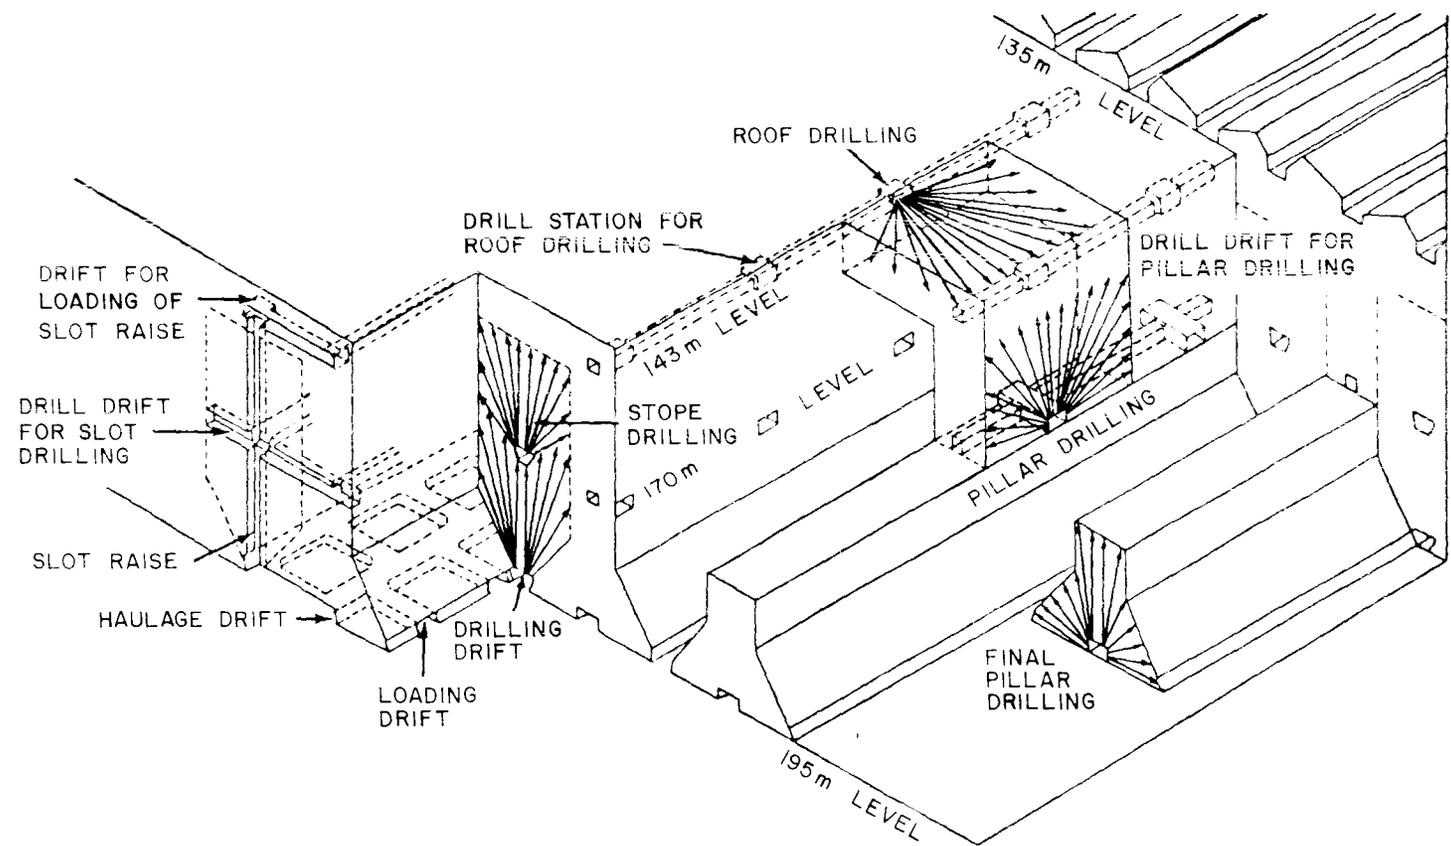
Sublevel Stoping at Strassa, Sweden -- from Dravo Corporation, 1974
